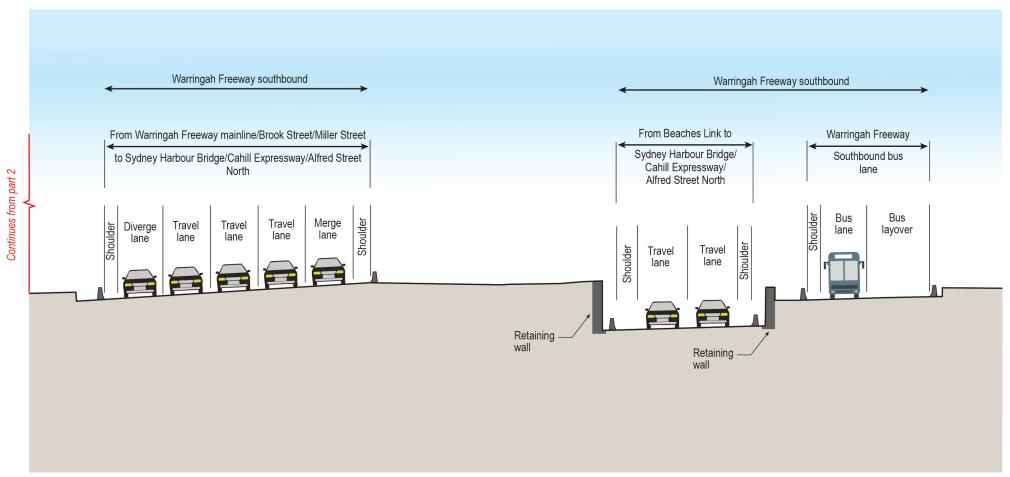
Indicative cross-section through the connection between the Beaches Link and Gore Hill Freeway Connection project and the Warringah Freeway Upgrade (part 3)
